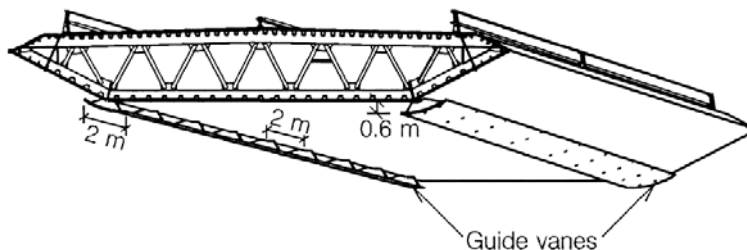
Bridge deck of Great Belt Bridge with guide vanes
